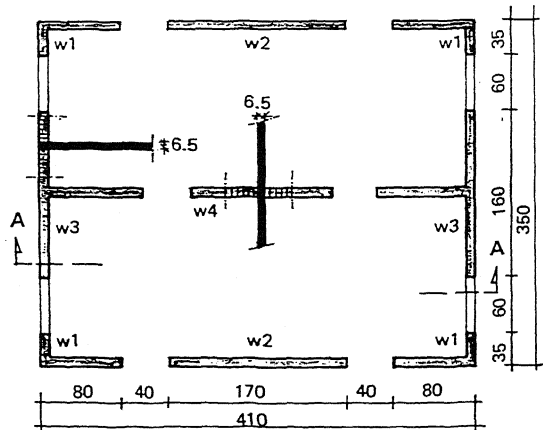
Plan of the 2nd, 3rd and 4th M1 floor.
